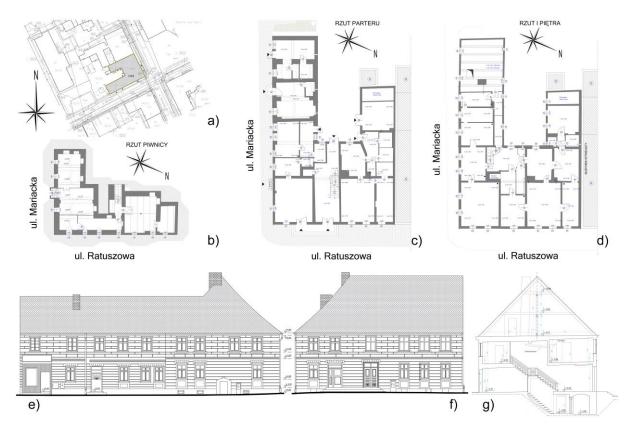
The location of the building is shown on the site plan: a), Floor plans - existing condition: b) Basement, c) Ground floor, d) Upper floor, Elevations – existing condition: e) Southern elevation – facing Mariacka Street, f) Eastern elevation – facing the market square (Ratuszowa Street), Section through the main block – existing condition: g). Source: original research
